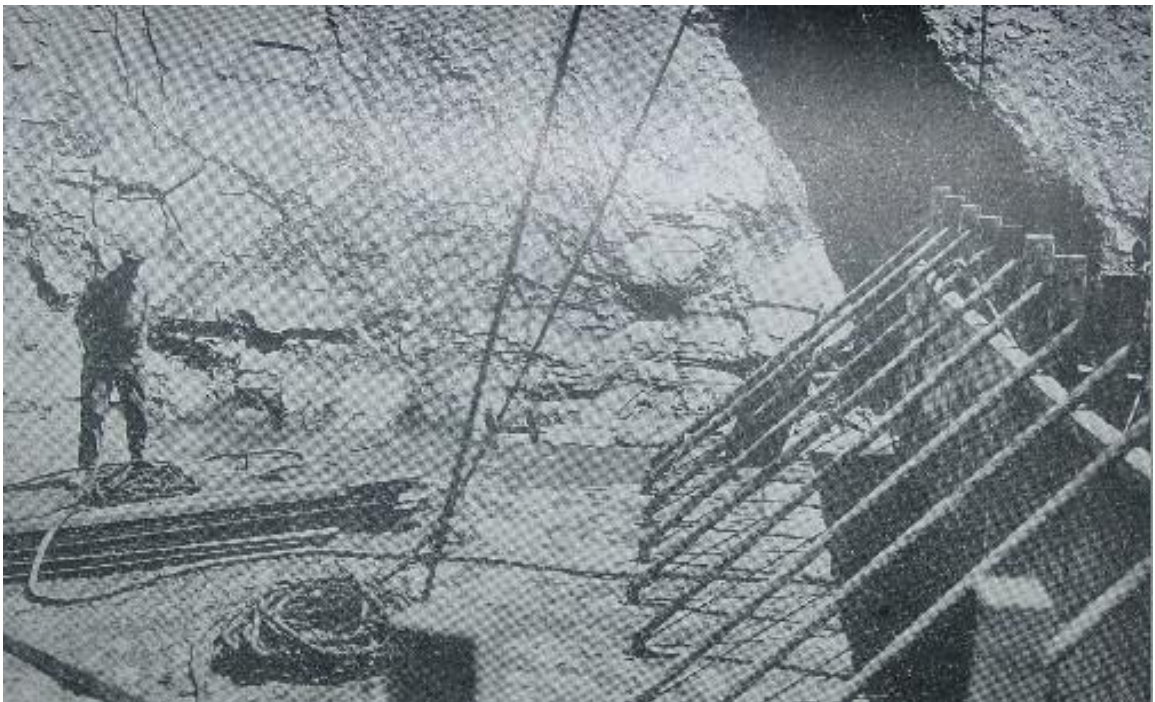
View of St. Francis Dam east abutment showing trenching up canyon wall.
